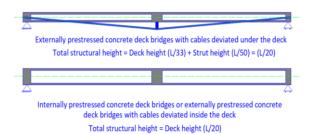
The appearance of externally prestressed concrete deck bridges with cables deviated under the deck with the same structural height of traditional solutions for medium spans range (internally prestressed concrete deck bridges and externally prestressed concrete deck bridges with cables deviated inside the deck) Table 6-2 Cost comparison between three different structural systems with different span-to-depth ratios for simply supported spans.
